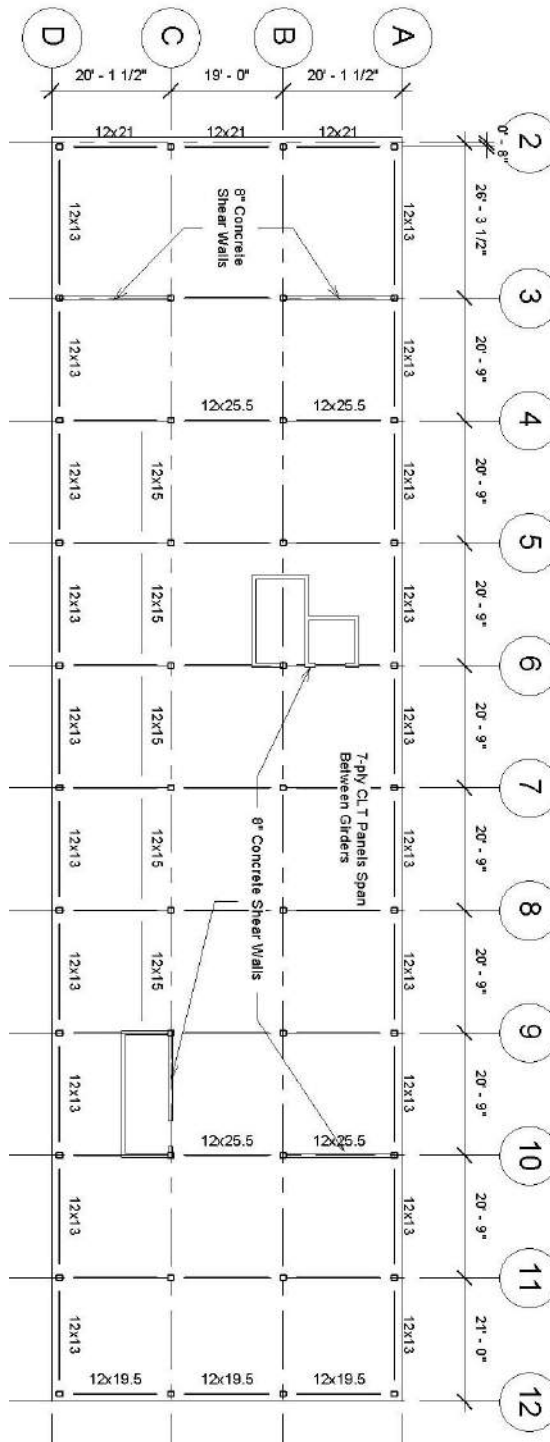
Typical Level Structural Plan. Unless otherwise noted, girders are 18" deep typ.
